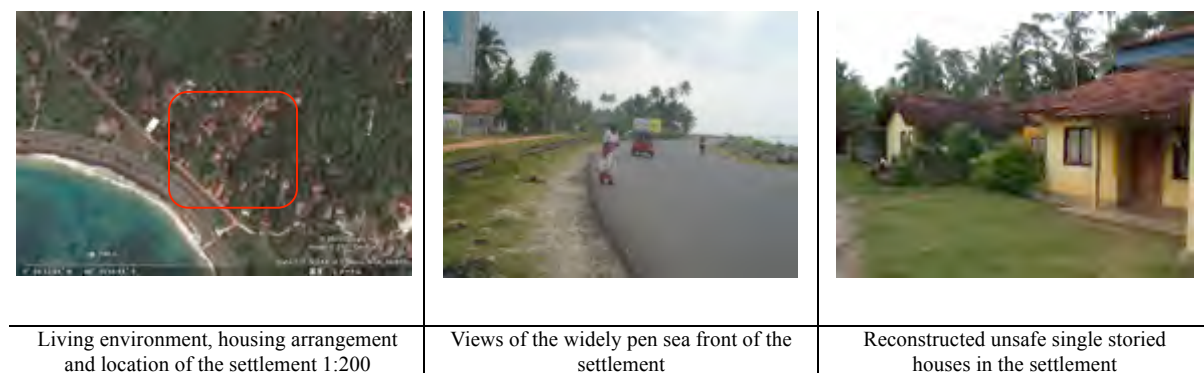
Surrounding and Inside Views of the Reconstructed “French Garden Village” Housing Settlement
